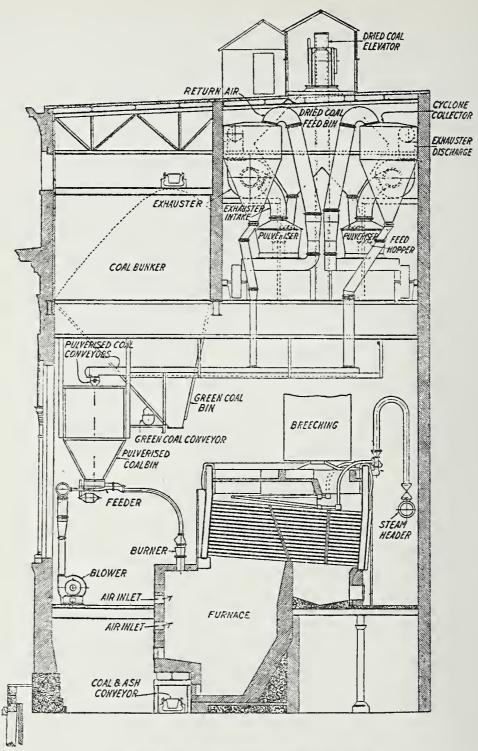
Oneida Street Power Station, Cross-Section through Boiler Plant
